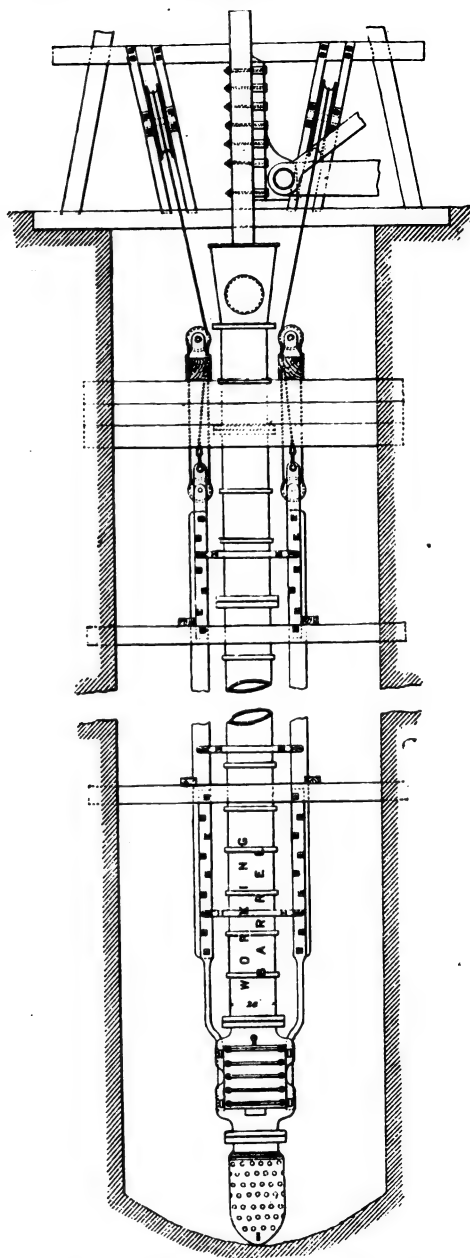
Manner of Suspending and Lowering a Sinking Set in a Shaft.
